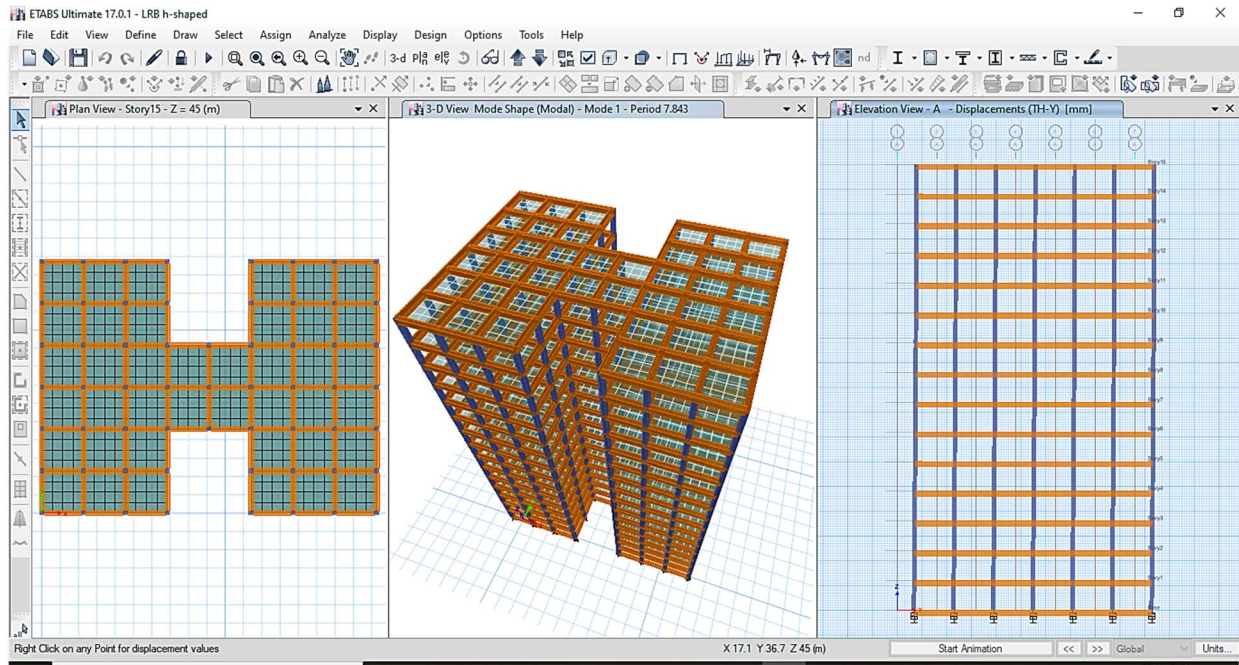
Plan, 3D & Elevation view of LRB base H-shaped plan building
